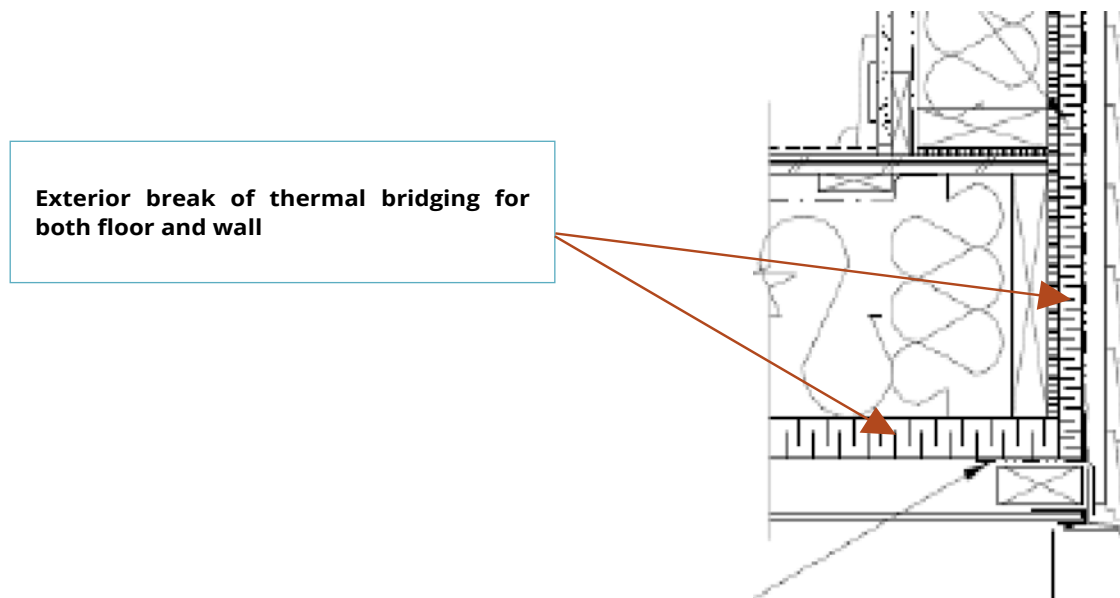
TYPICAL DETAIL OF WALL-FLOOR JUNCTION/ SOURCE: SHQ
